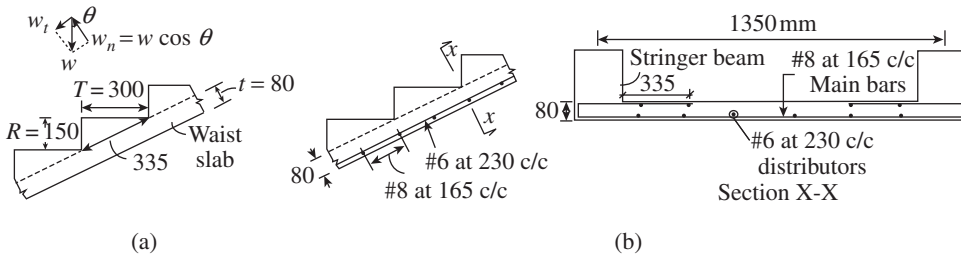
Transversely supported waist slab stair of Example 17.4 (a) Configuration (b) Detailing
